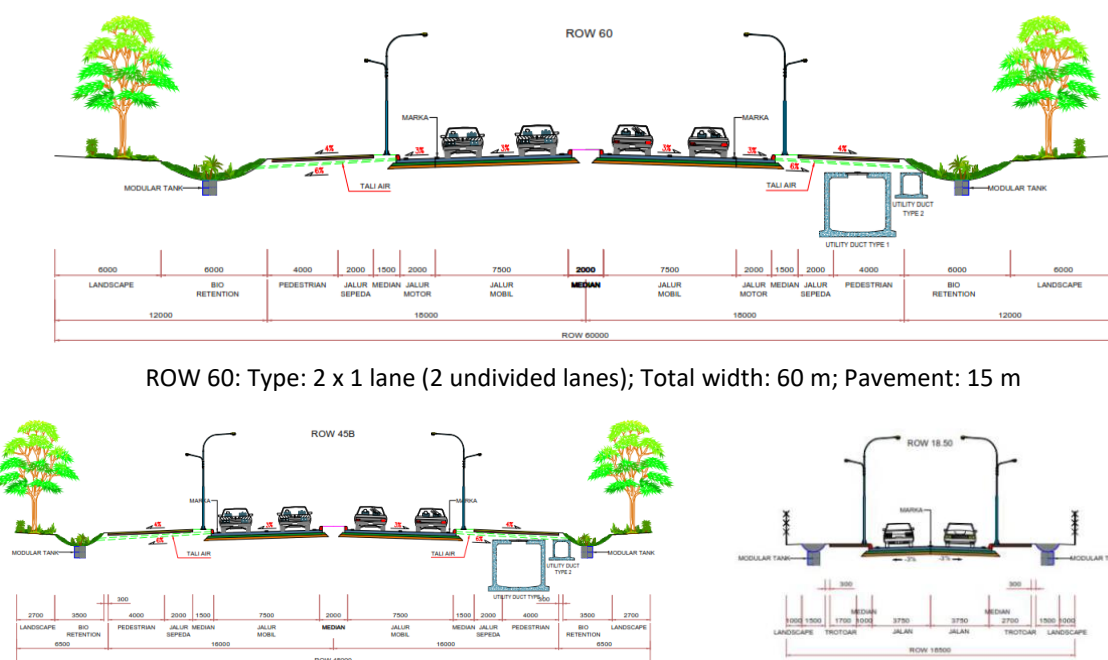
Examples of Cross Sections - ROW 17.5, 45B, and 60
